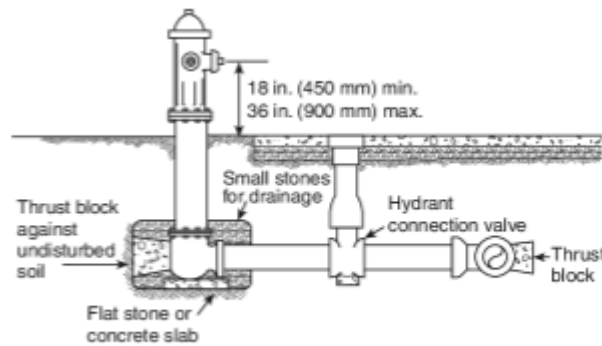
Typical Dry Barrel Hydrant Connection.
